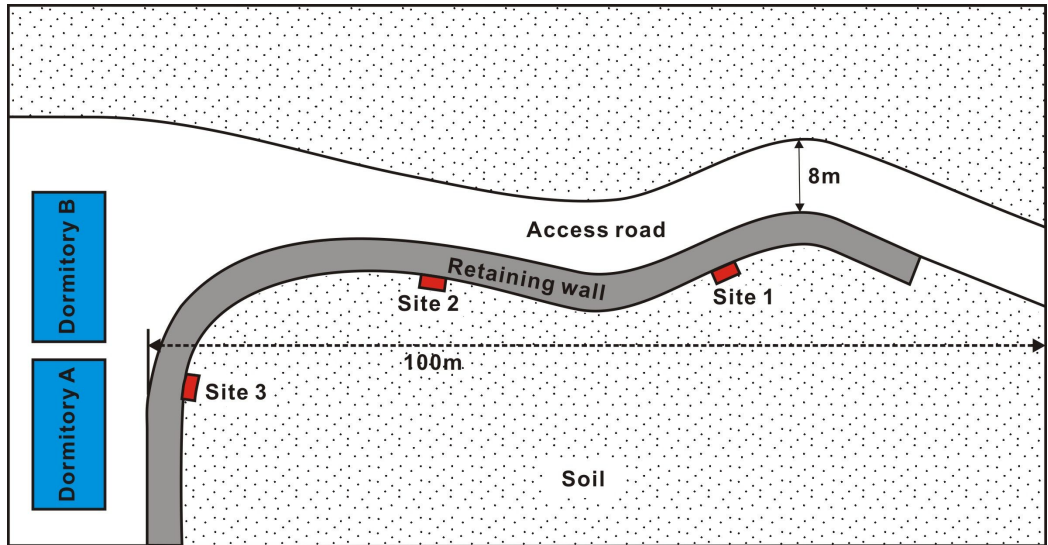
Location of spiral bolt strain gauge installed into retaining wall(Site 1, Site 2, Site 3).
